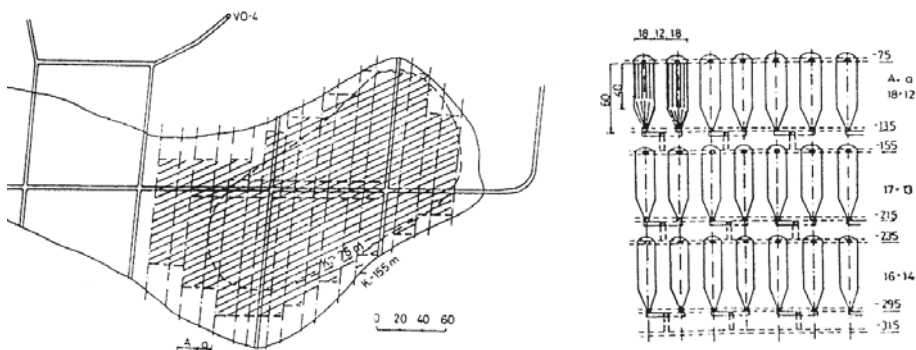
The mining layout in the ore body , horizontal and vertical sectionplane (K -155)
